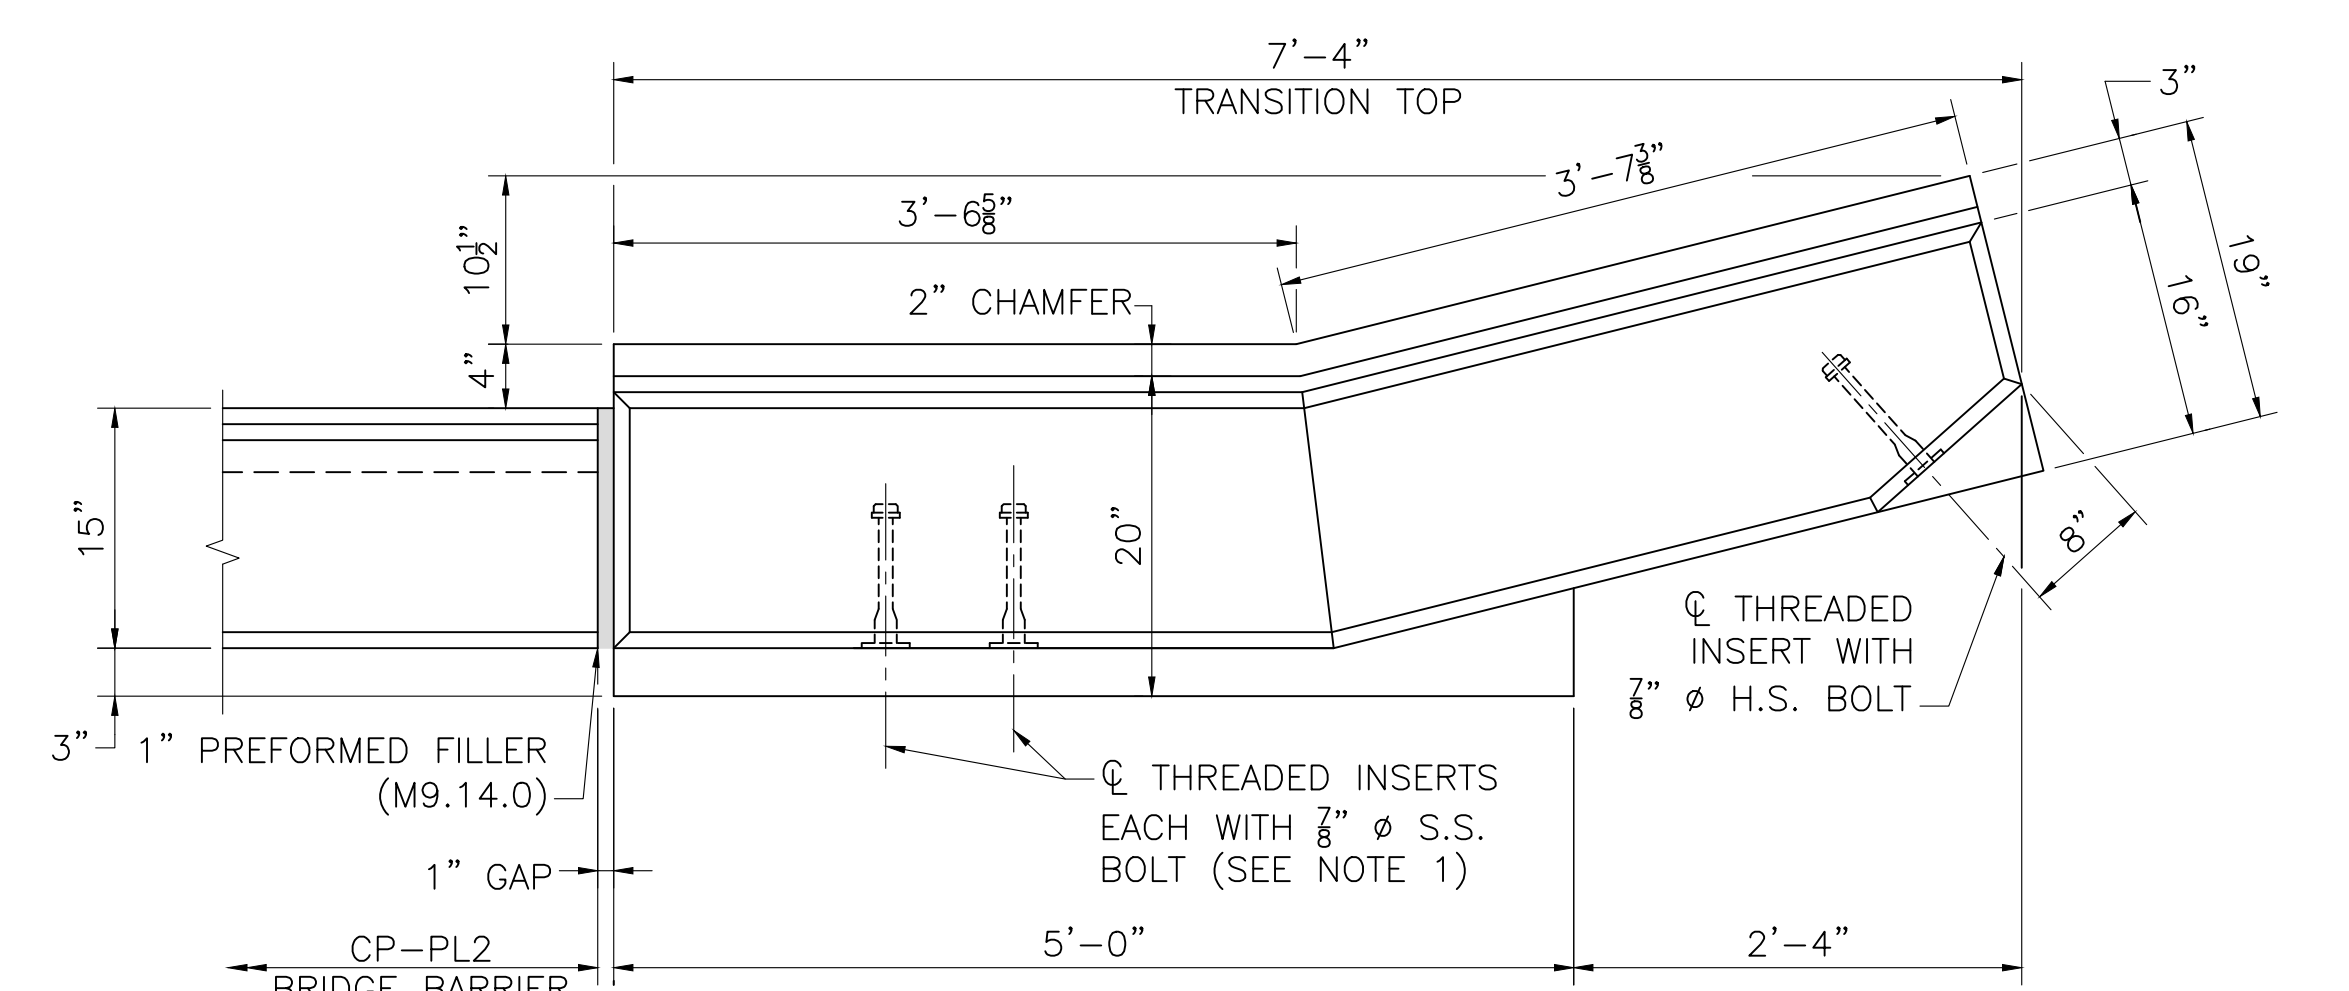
DETAILS AT ABUTMENT - ROADWAY SECTION
